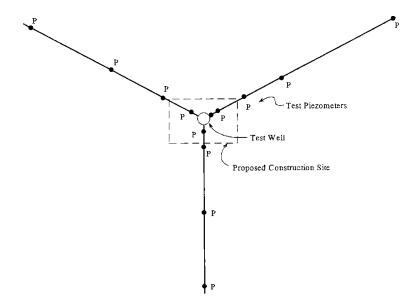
A General Configuration and Layout of Piezometers for a Pumping Test.
